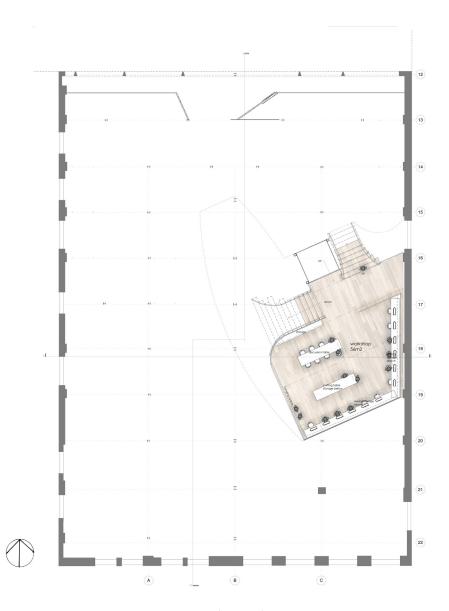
New Mezzanine Floor plan- not to scale (Author, 2013)
